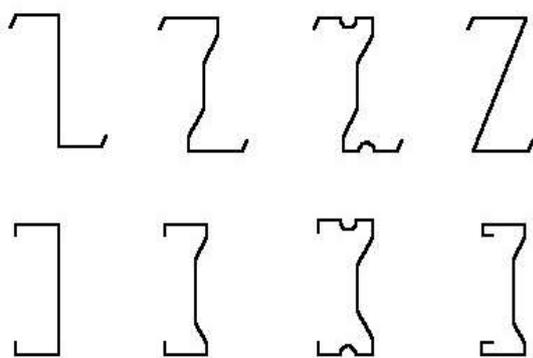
Types of stiffened sections that stiffened at different locations in Z section & C sections [1]
